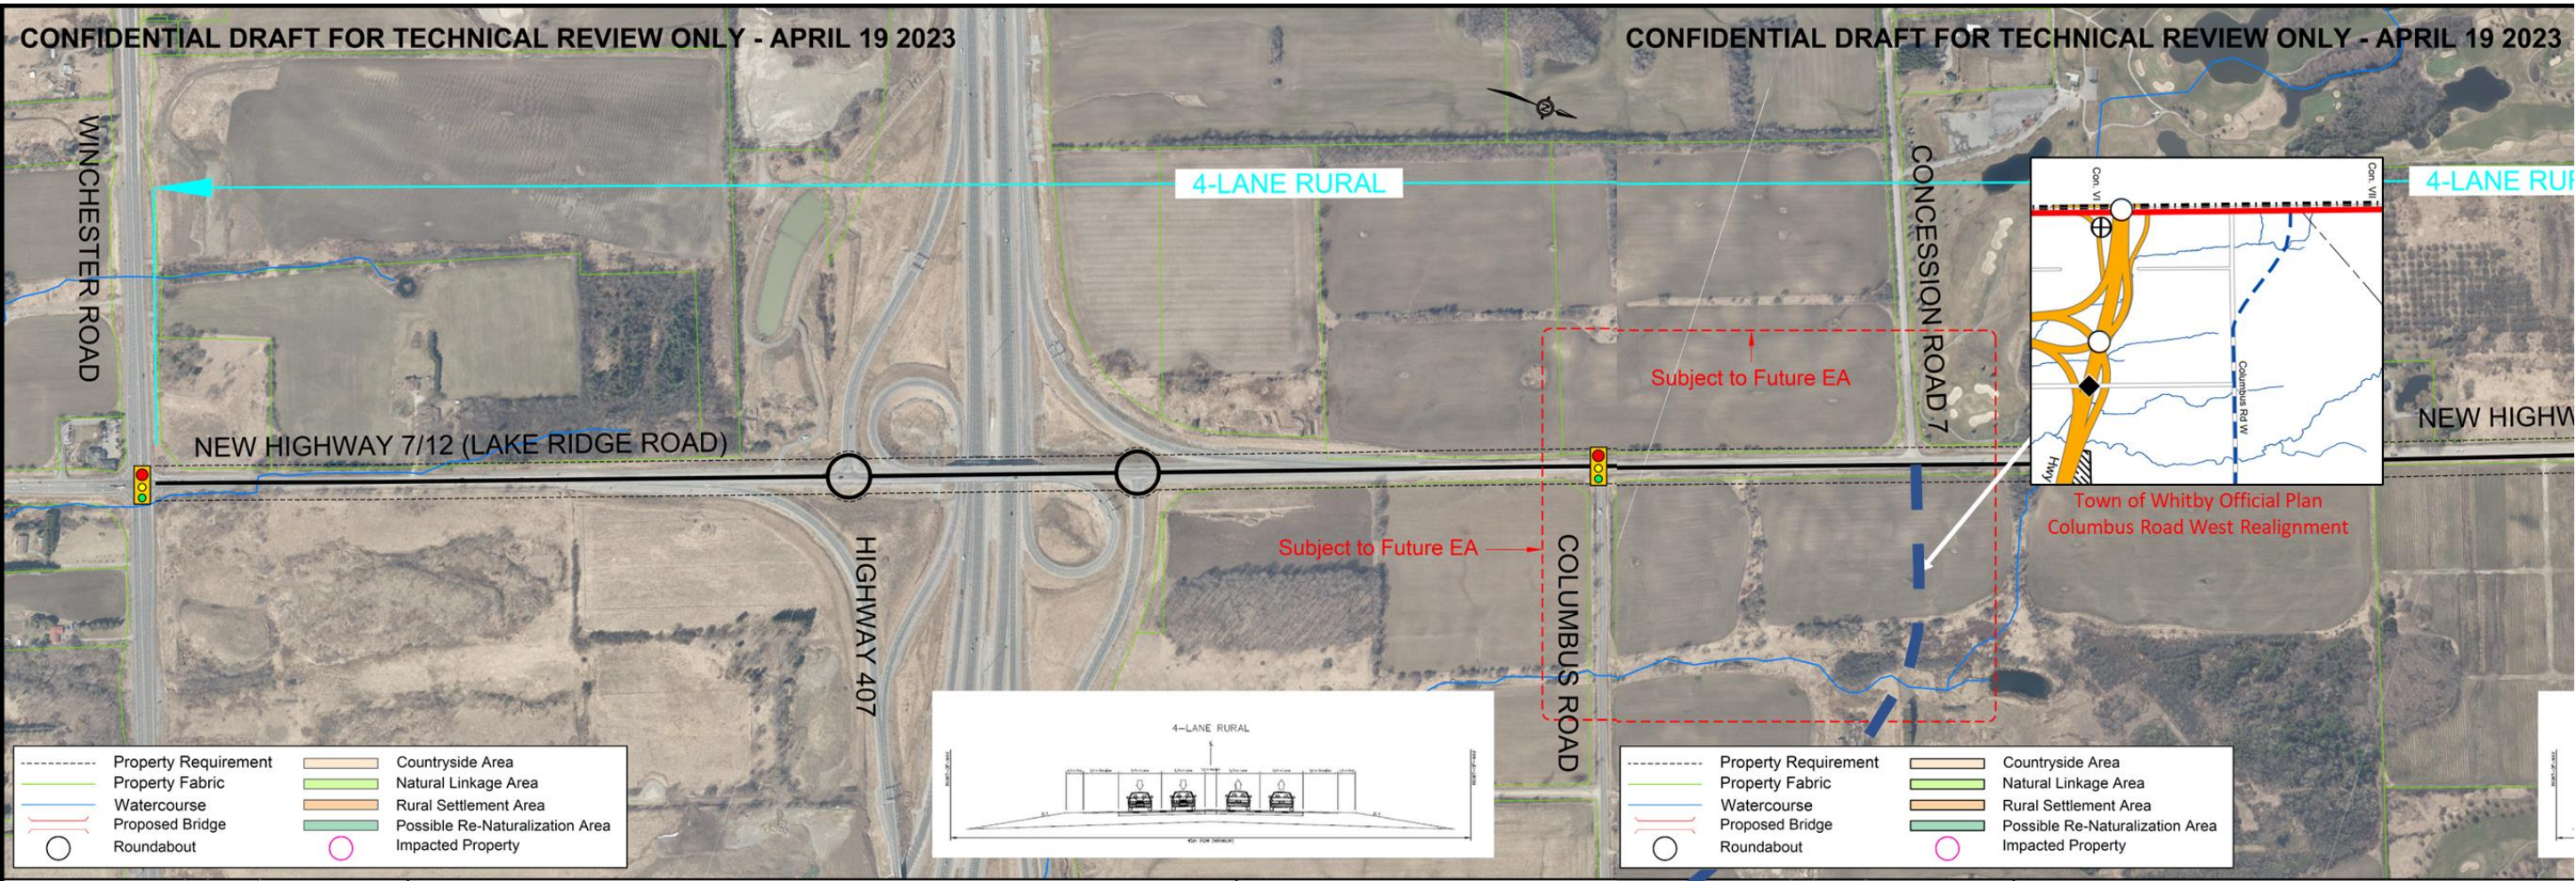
Technically Preferred Alternative (Red Box Labelling Columbus Road Future EA)
